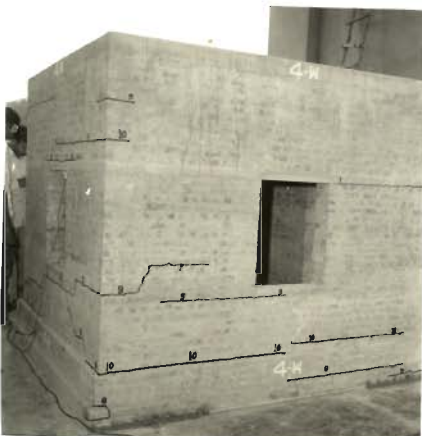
\_ MOSTLY HORIZONTAL CRACKS IN WEST CROSS-WALLS (MODEL 4)
